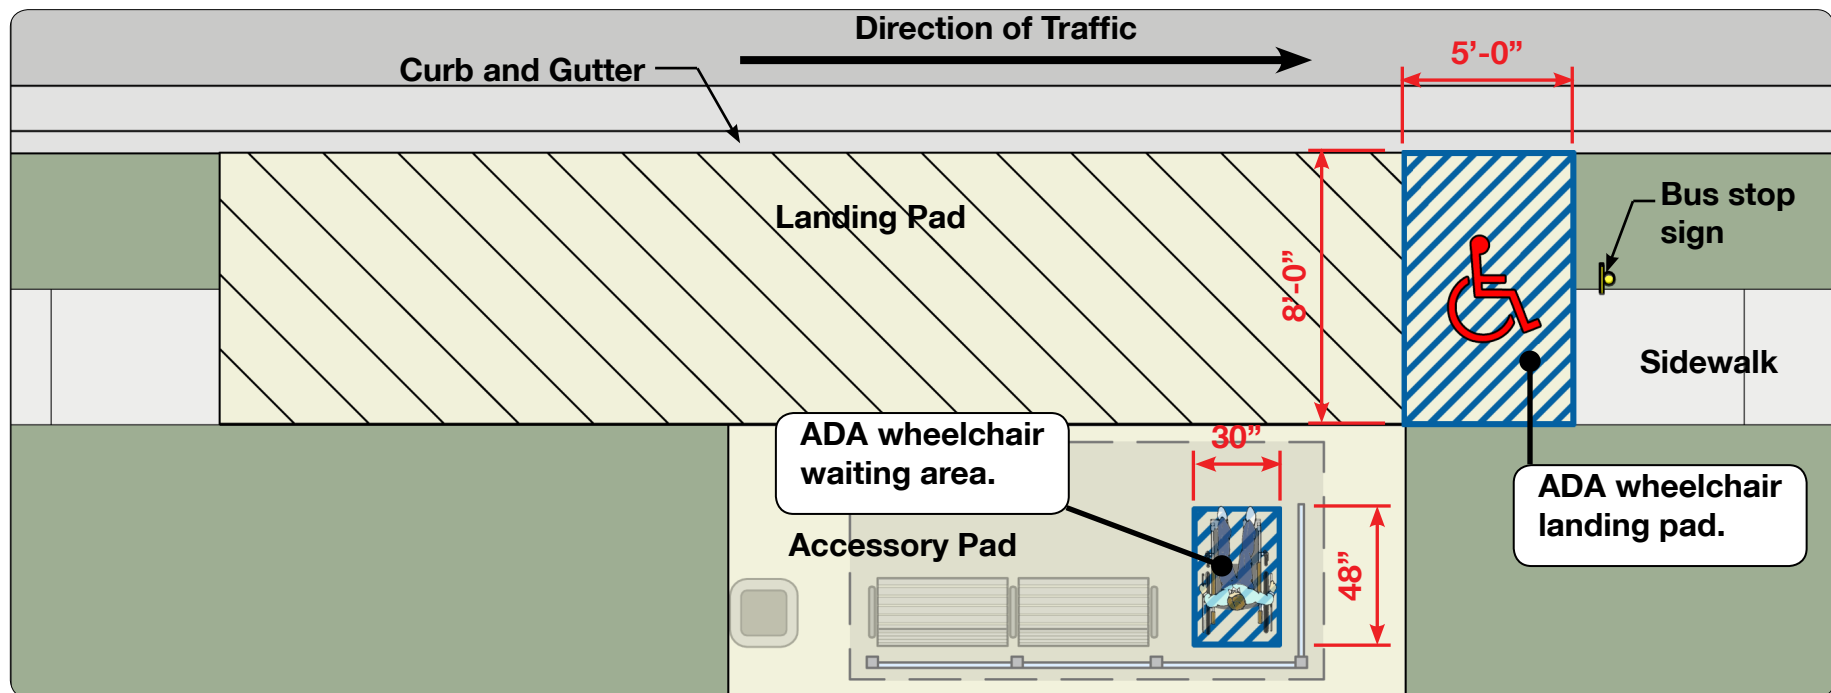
Accessible Landing Pad and Separate Wheelchair Waiting Area
